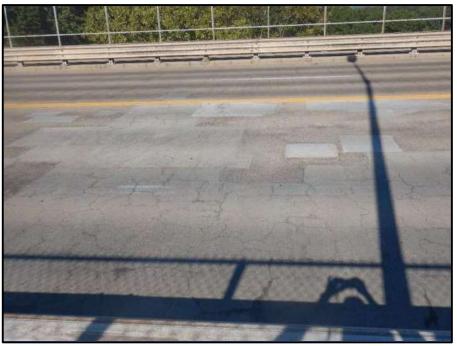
Looking west at northbound lanes of bridge wearing surface in span 1. Note: cracking in patches throughout.
